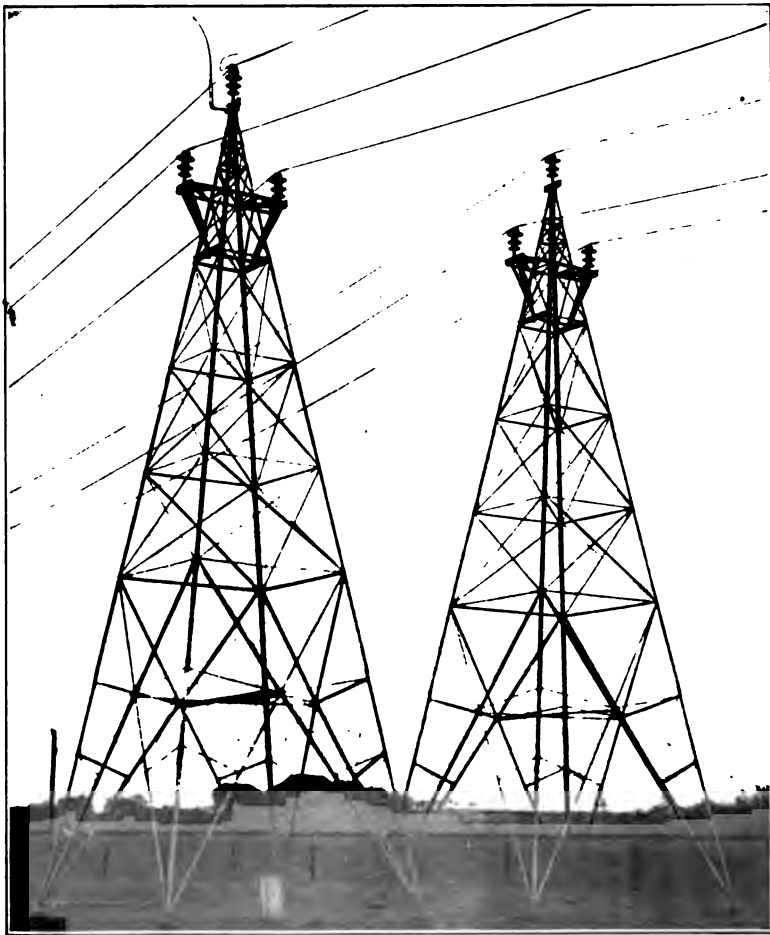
55-ft. structural steel towers, showing a relief gap, as used in 1907
